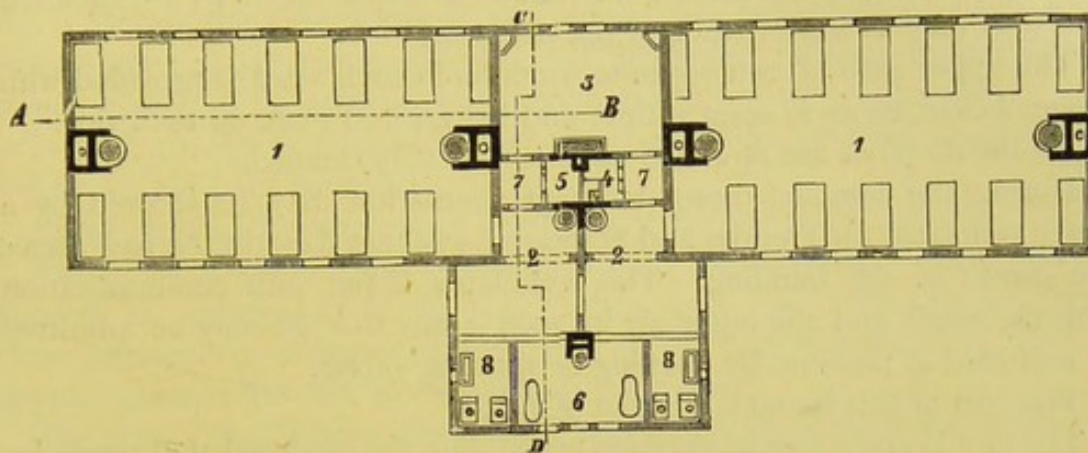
PERMANENT BUILDING FOR ISOLATION.
